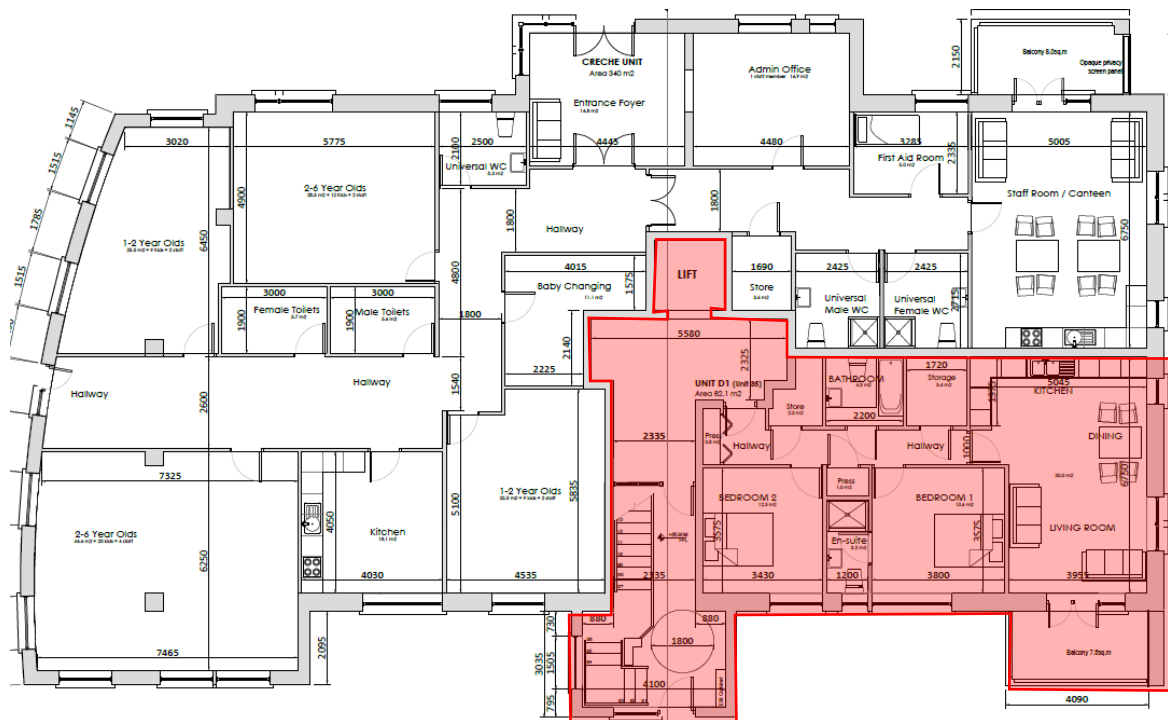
Proposed ground floor plan of Apartment Block D. There is one no. residential apartment provided at this level. This apartment, its associated access corridor and the lift to the upper floor levels are outlined in red above, with the balance of this floor accommodate a crèche facility.
